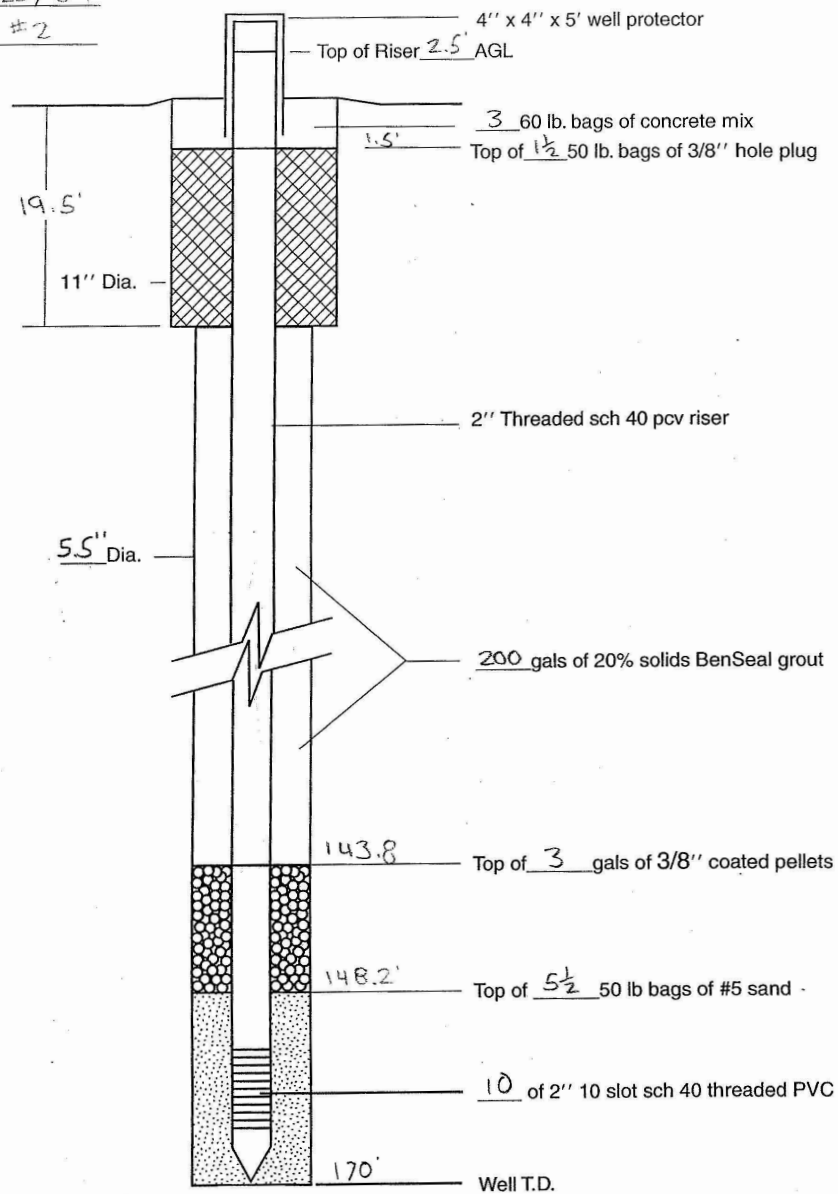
Details of groundwater monitoring well construction, MH-2.
